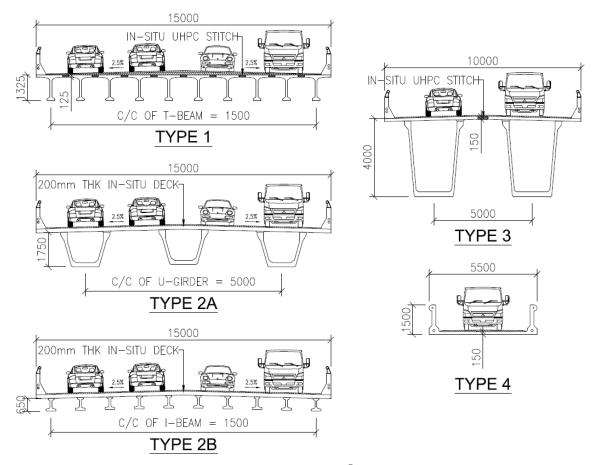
Four different types of DURA® UHPFRC bridge girders.
